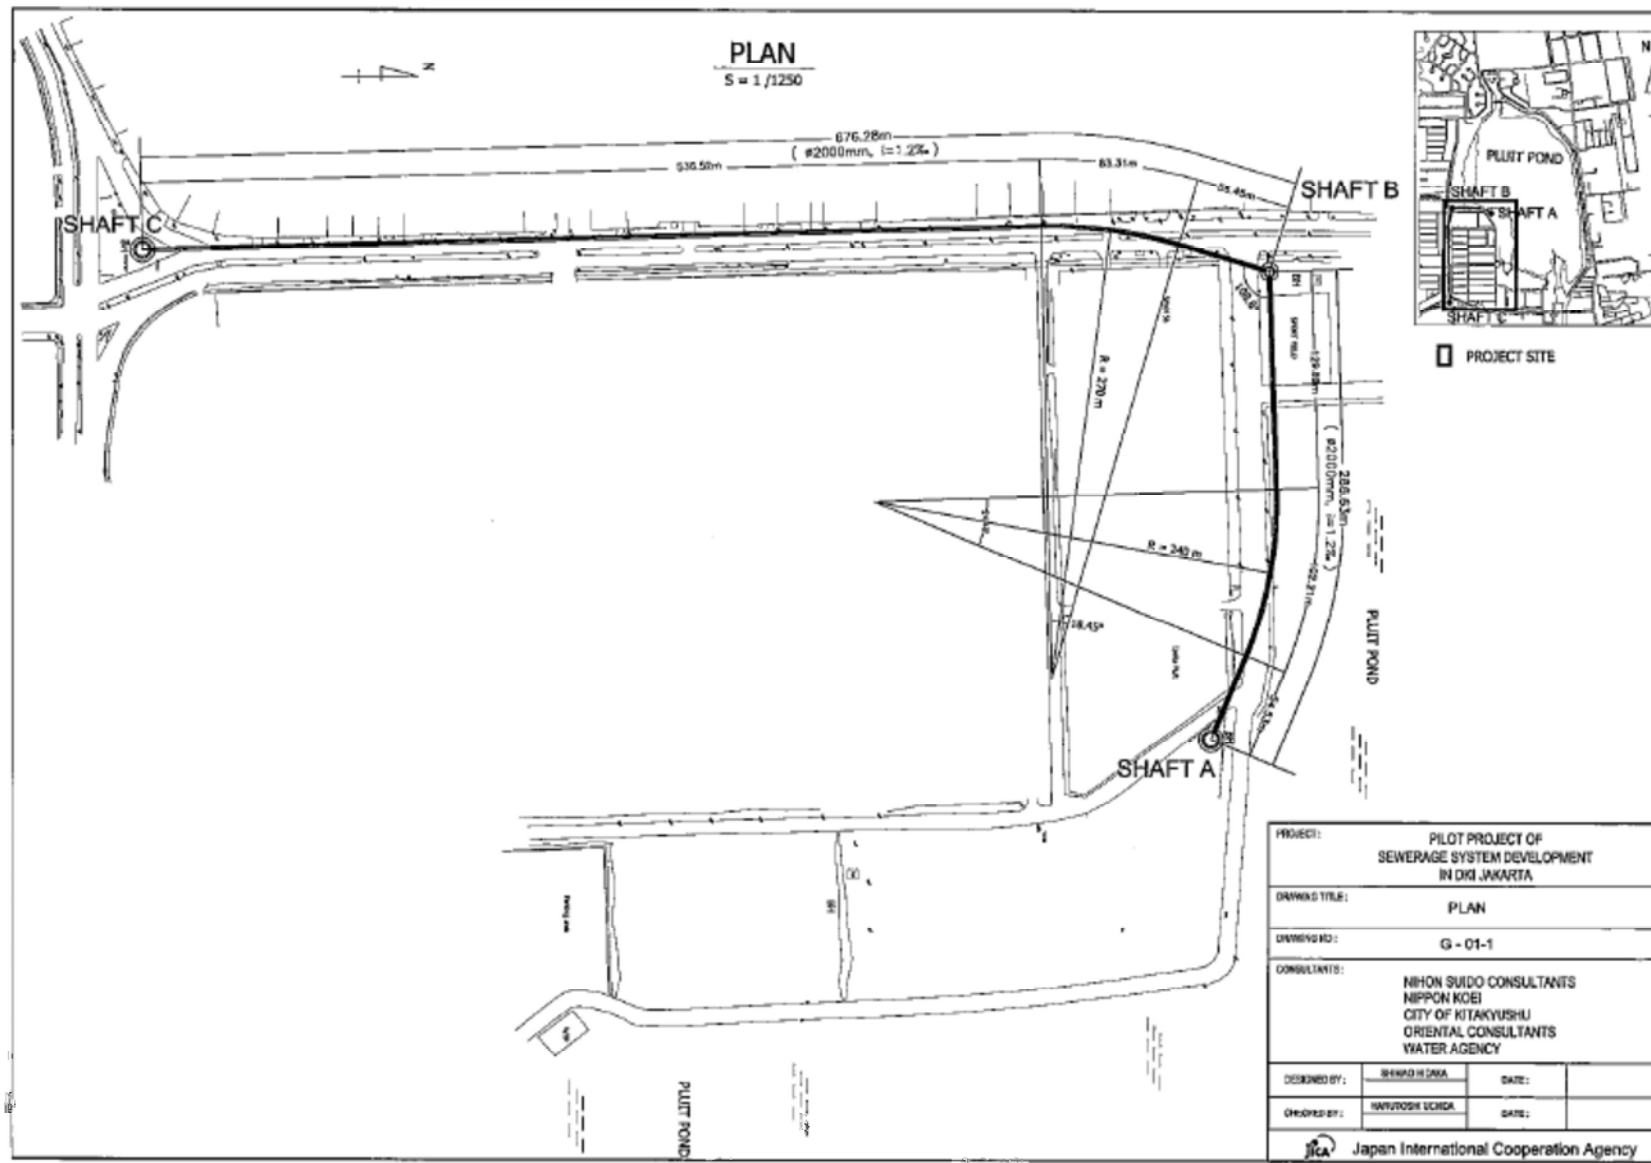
Plan of Trunk Sewers of Pilot Project
